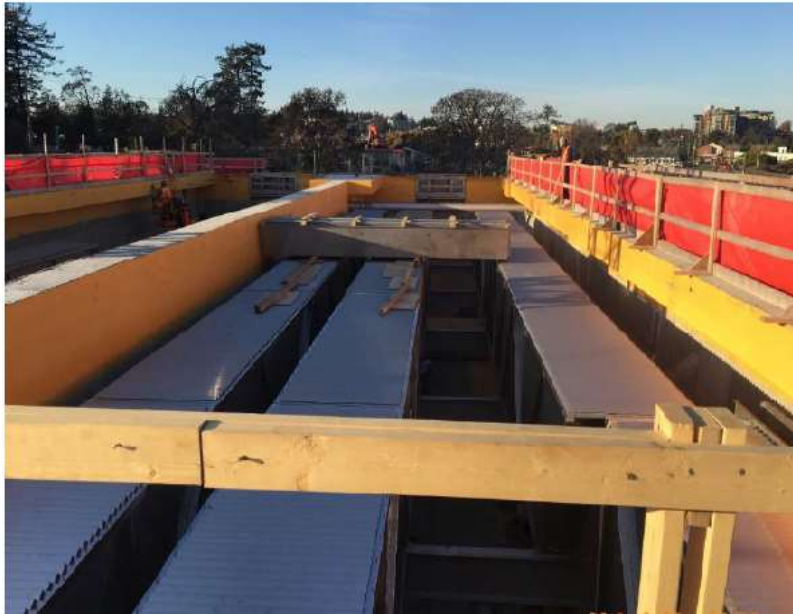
McLoughlin Point Wastewater Treatment Plant- Lamella 1 plate rack installation
